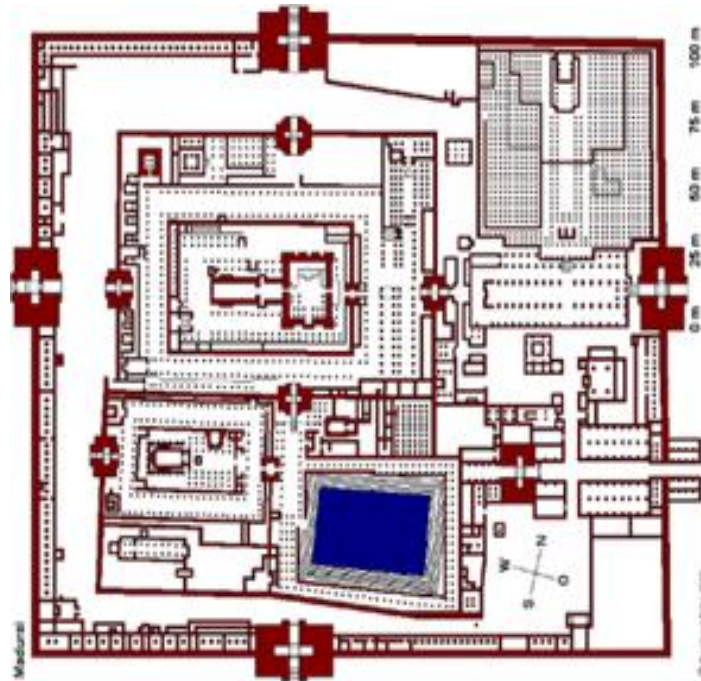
Plan of a typical Dravida style Temple as depicted by the plan of Meenakshi Temple
